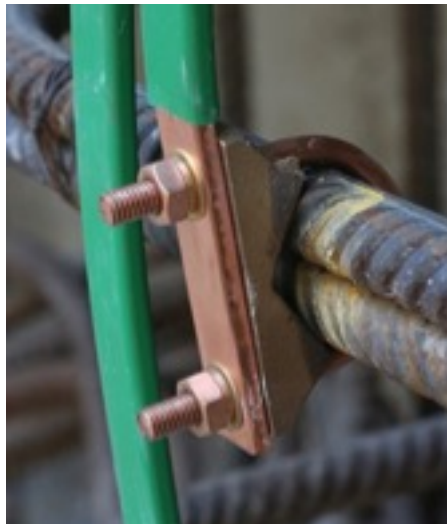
Copper Tape Connection to rebar (Jonathan King FIET)
